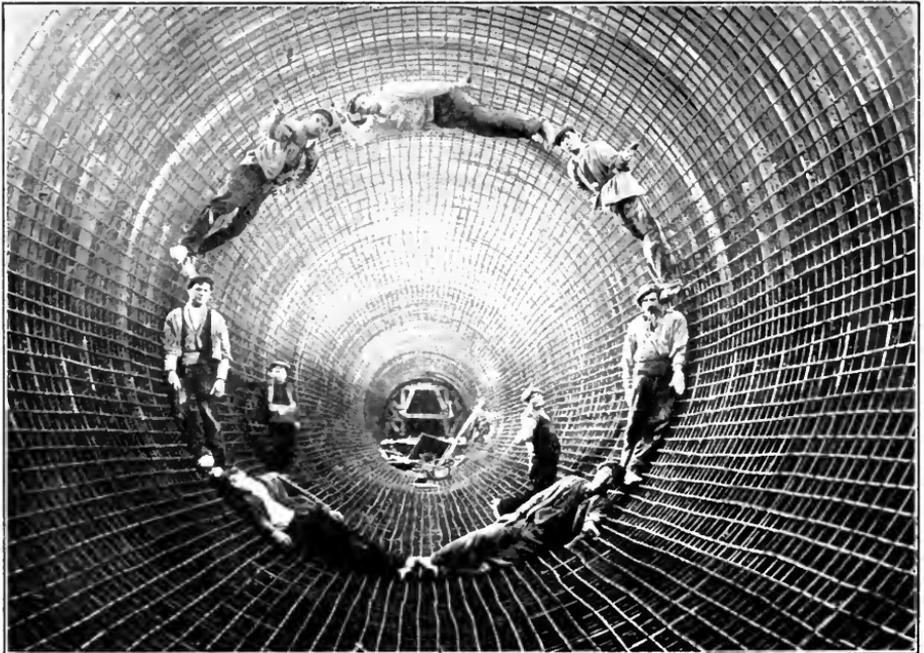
FIG. D.—Steel reinforcement in place for Albelda Siphon, Spain.
